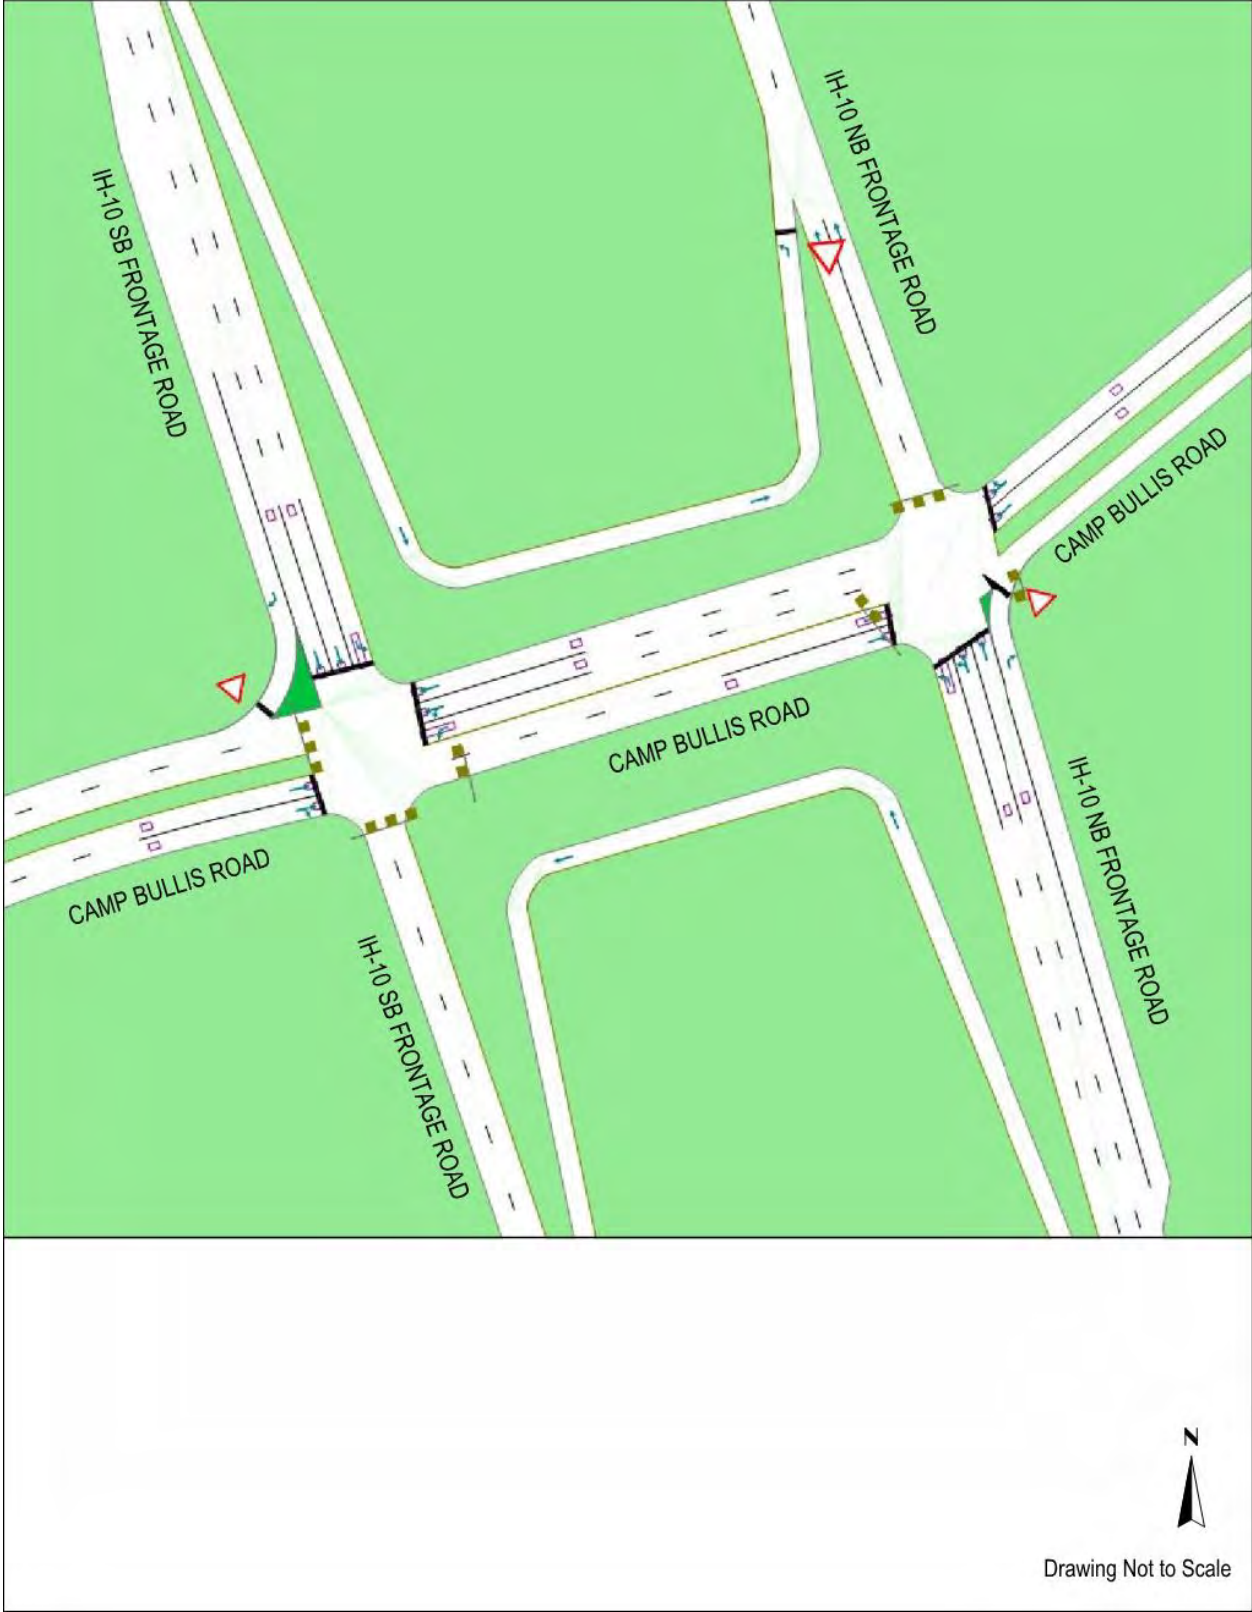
I-10 and Camp Bullis Road Existing Geometric Conditions
